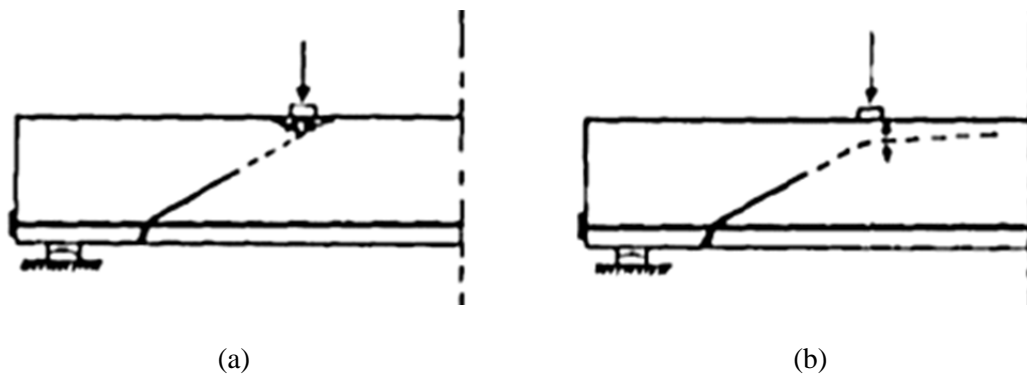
Failure modes of reinforced concrete beams: (a) generally accepted failure mode, (b) failure mode of concrete beams with values of a/d between 1 and 2.5 (Kotsovos, 1984).
